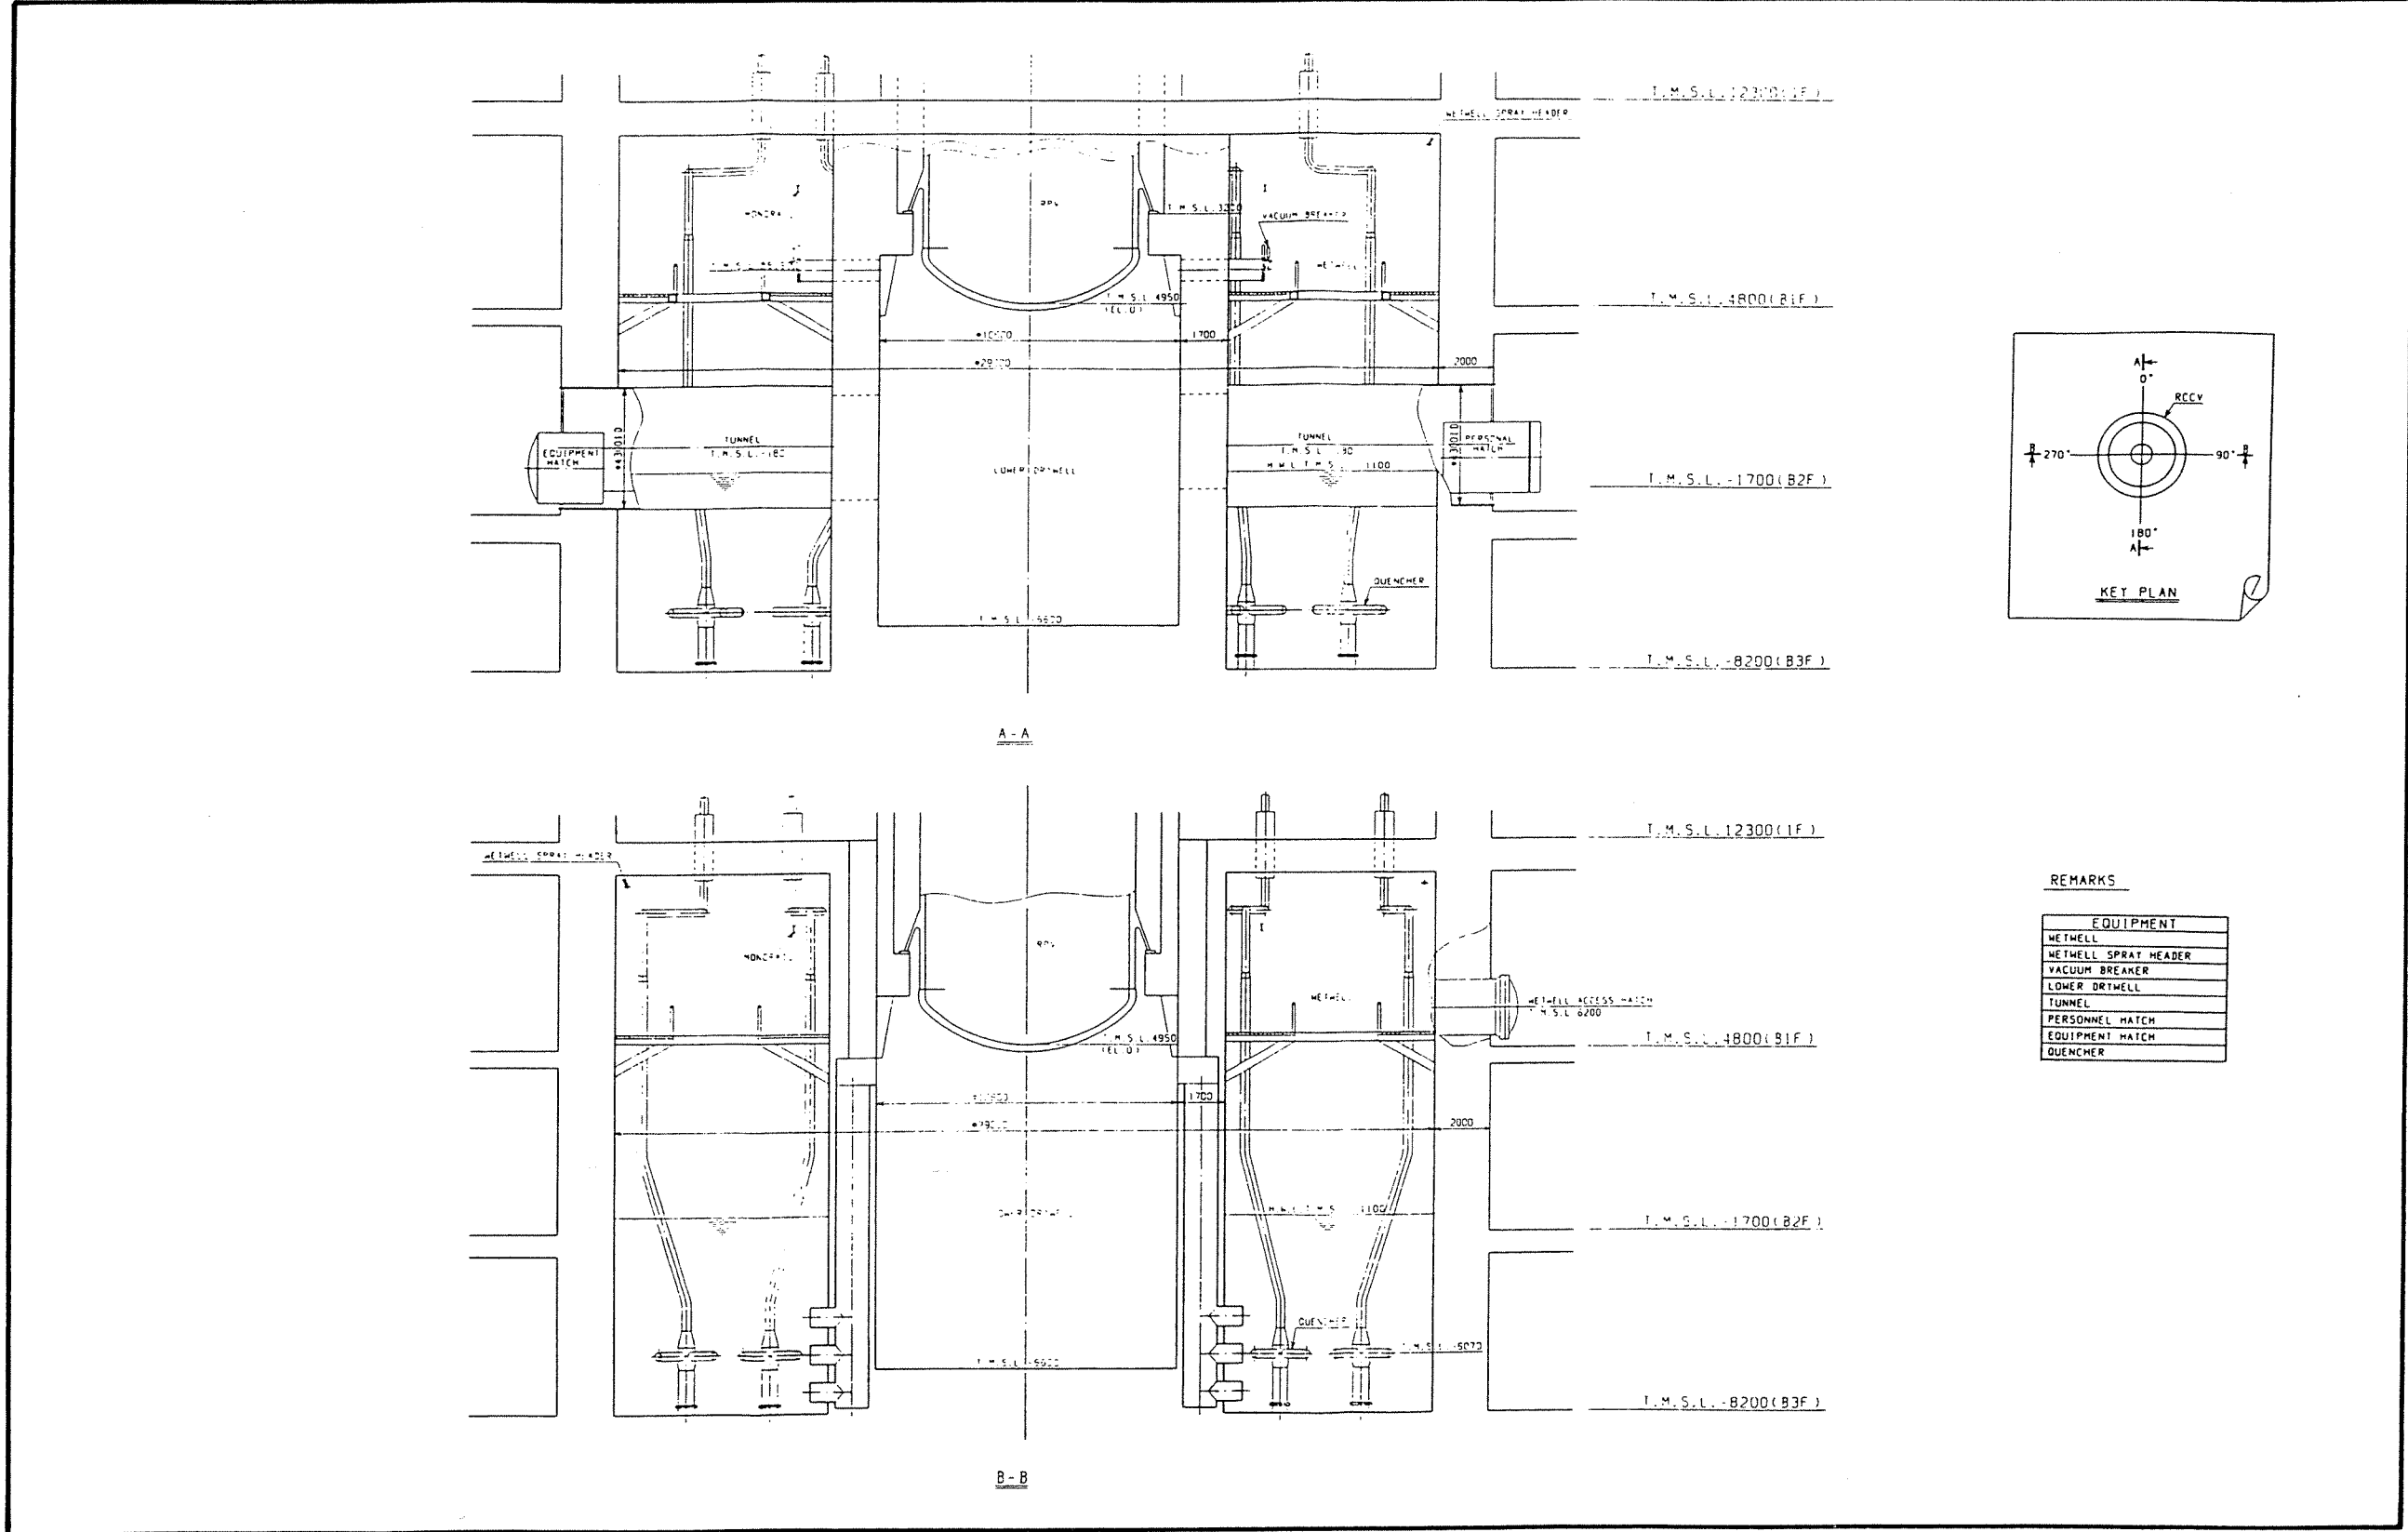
LOWER DRYWELL, ARRANGEMENT ELEVATION, SECTION A-A
